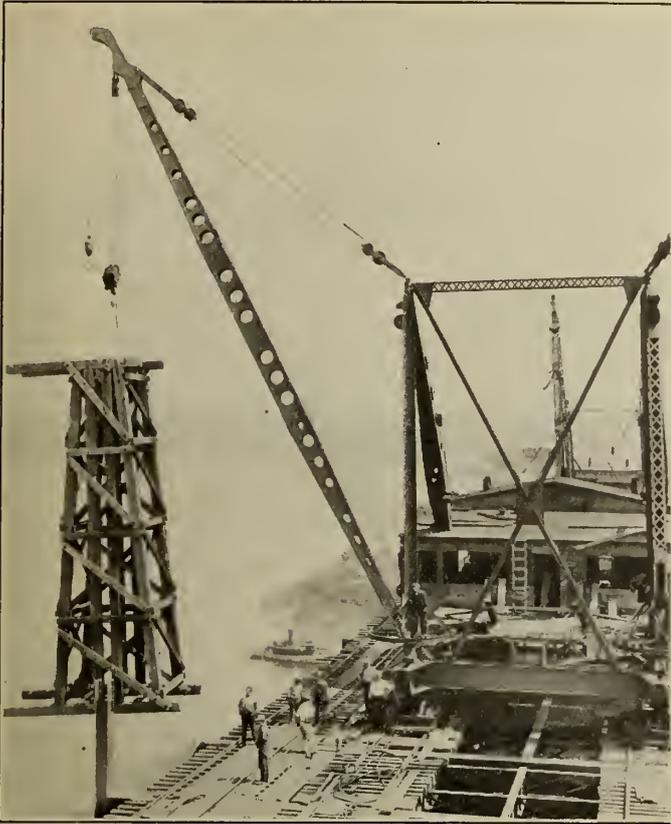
South Approach—Front View of Traveller No. 1 handling Timber Falsework.
